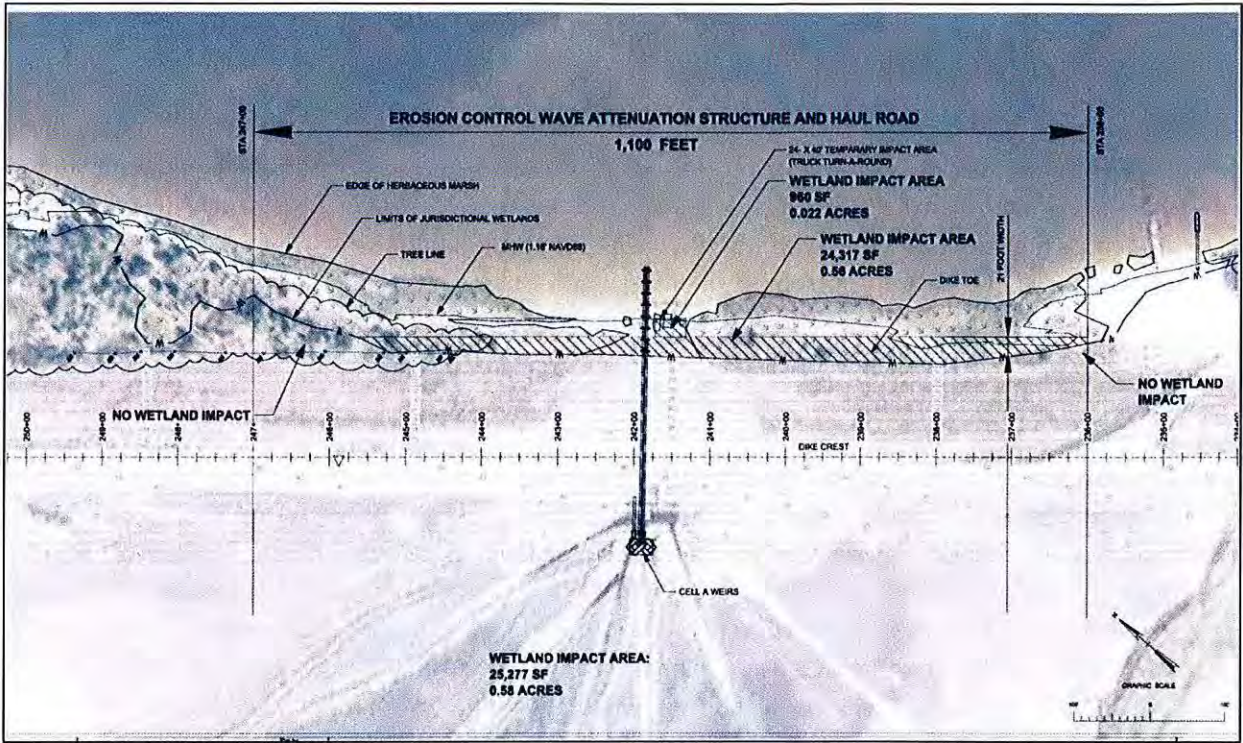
(Permit Plate C-02). Plan view of impact area from footprint of wave attenuation structure.
